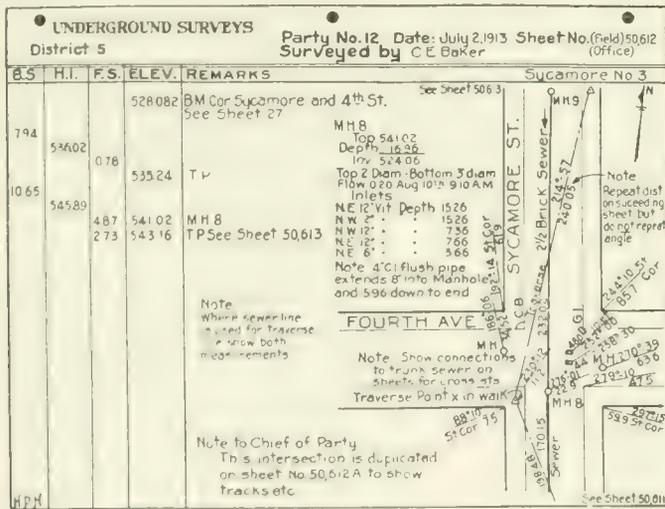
Typical Field Sheet, Cincinnati Underground Surveys.
